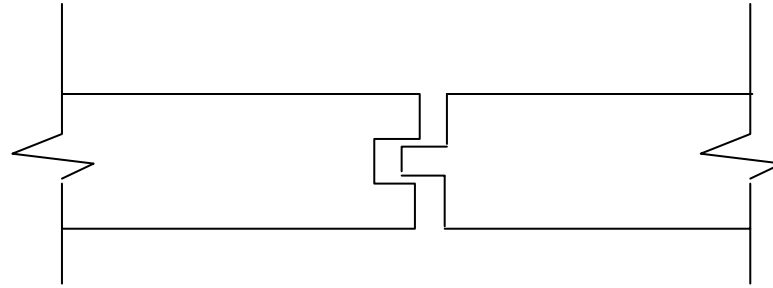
Tongue and Groove Joint of Wooden Planks.
